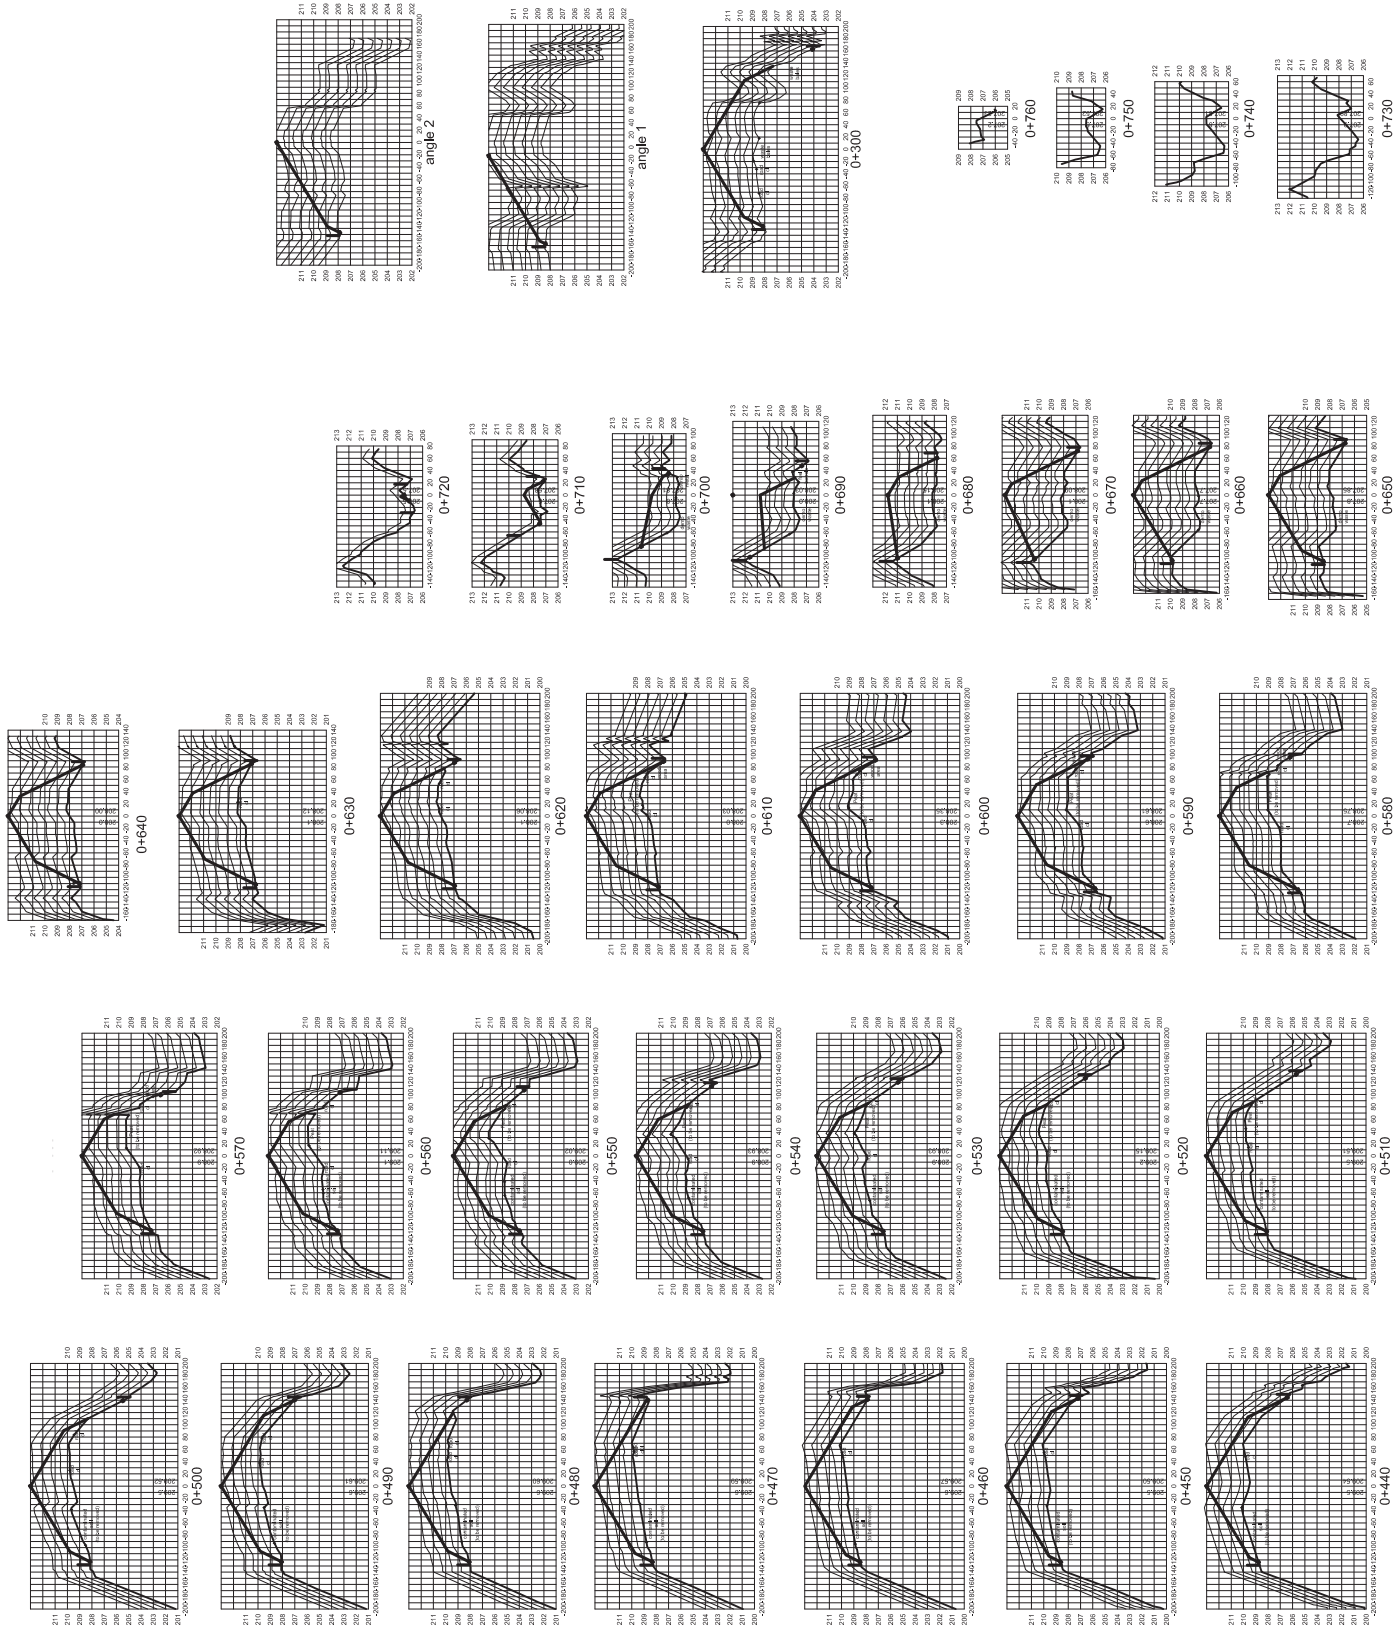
Proposed Top of Waste Fill Contour Cross Sections
